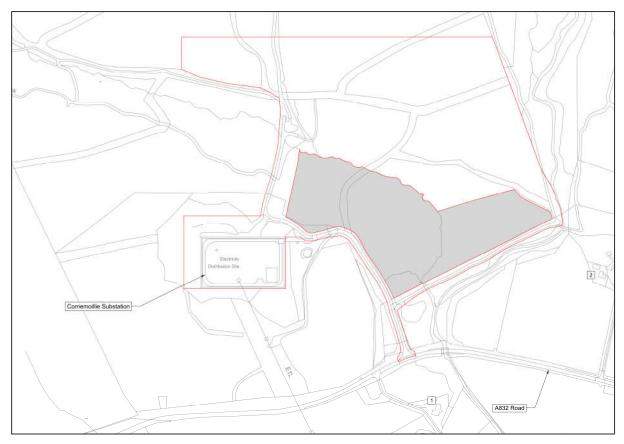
Site Location Plan (Extract from BTGBCOR01-002.1.2 Rev 3, Field 2024)
